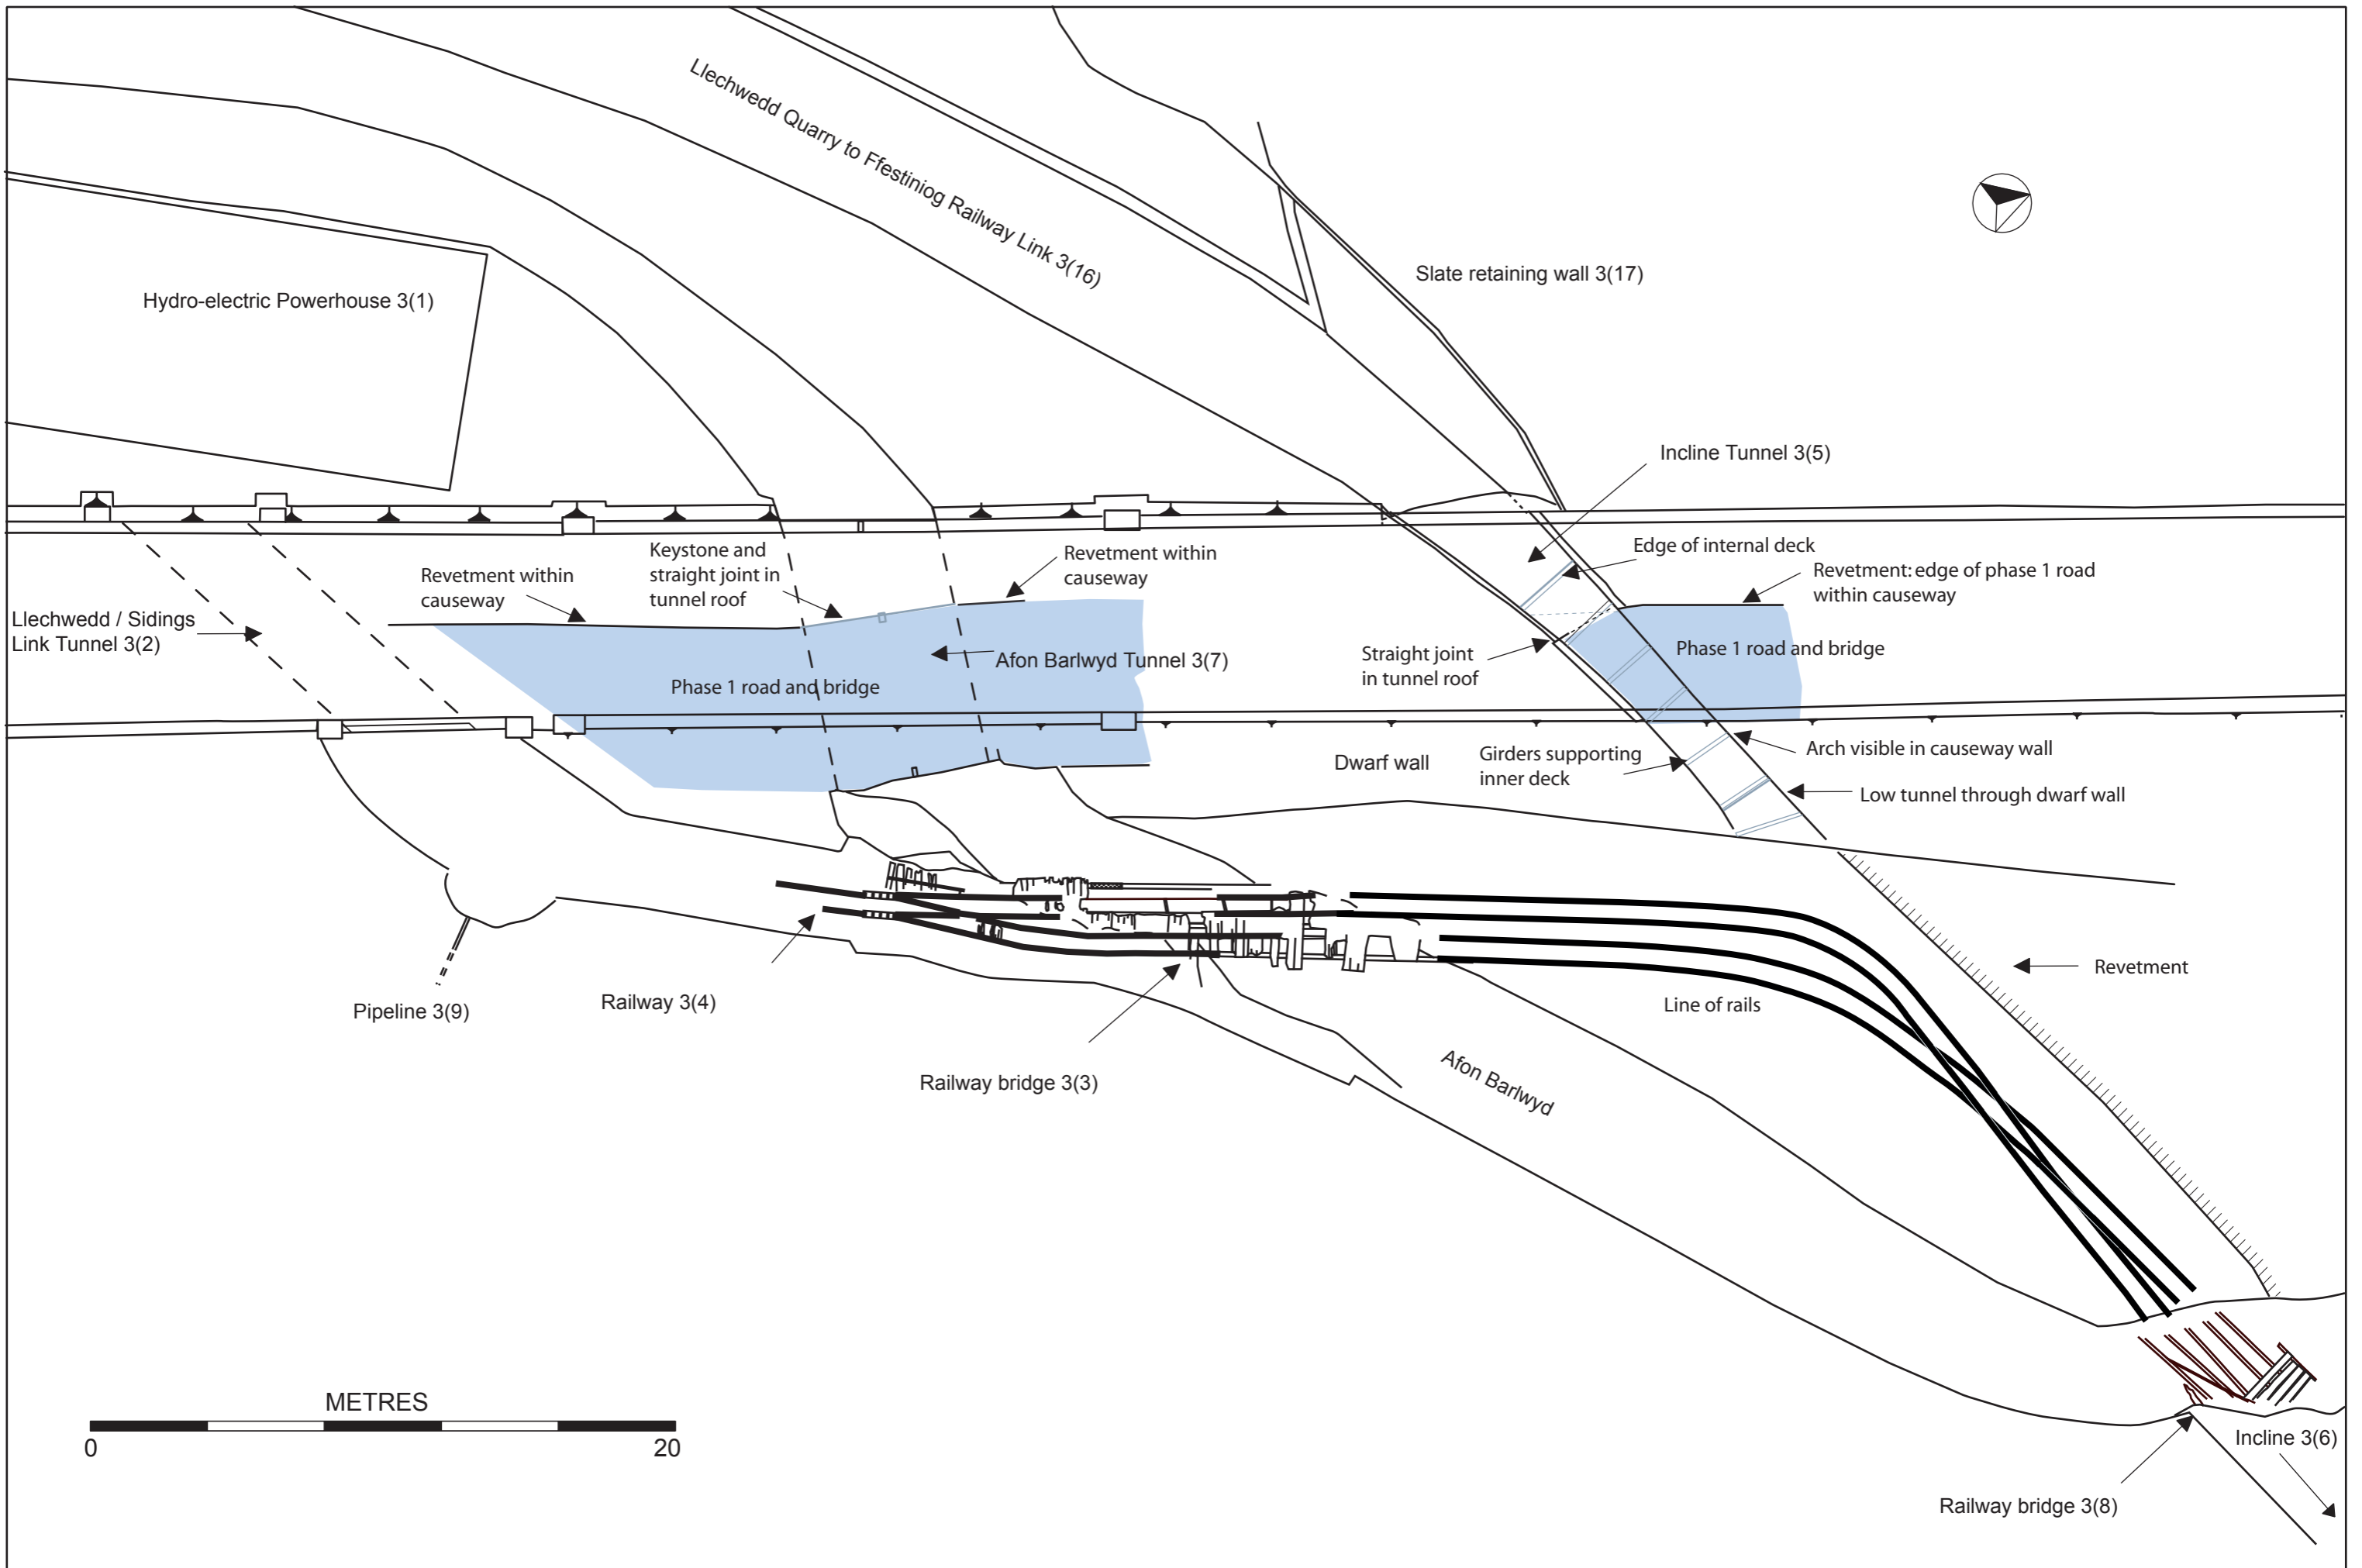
Llechwedd exchange sidings, north end showing details of the railway 3(4) and road causeway 3(32)
